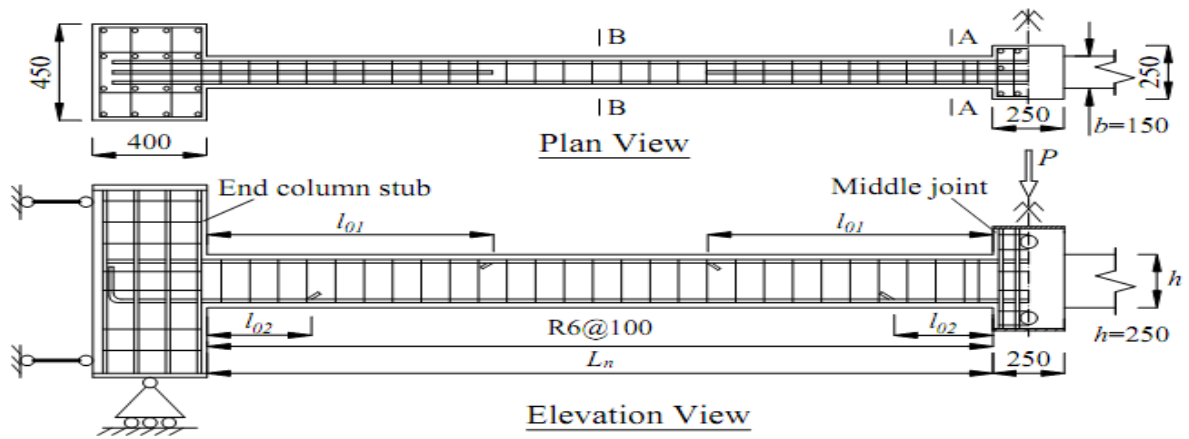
Detailing and boundary conditions of specimens (Unit: mm) (Yu and Tan 2013)
